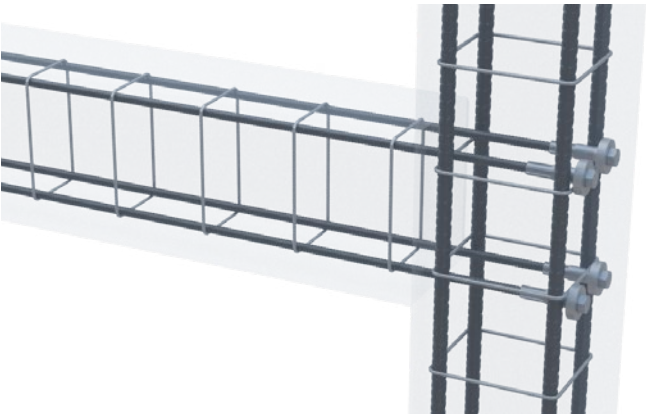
EXAMPLE OF INSTALLATION MODIX® EM HEADED ANCHORS ON SITE
